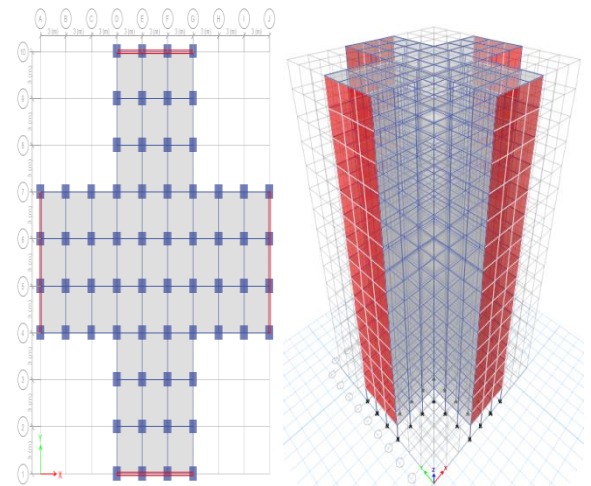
Plan and 3D view of building with shear wall provided at sides (soft storey)
